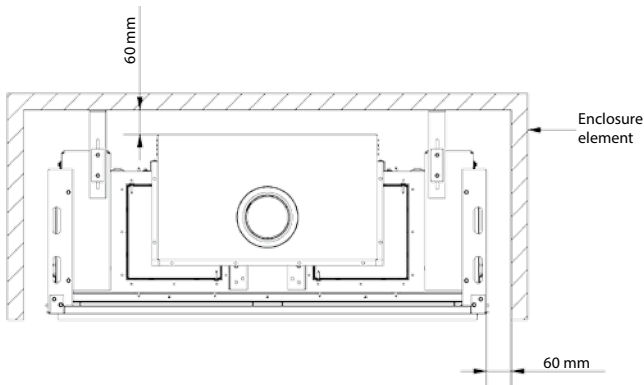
The minimum distance of the gas insert from the flammable housing components.
